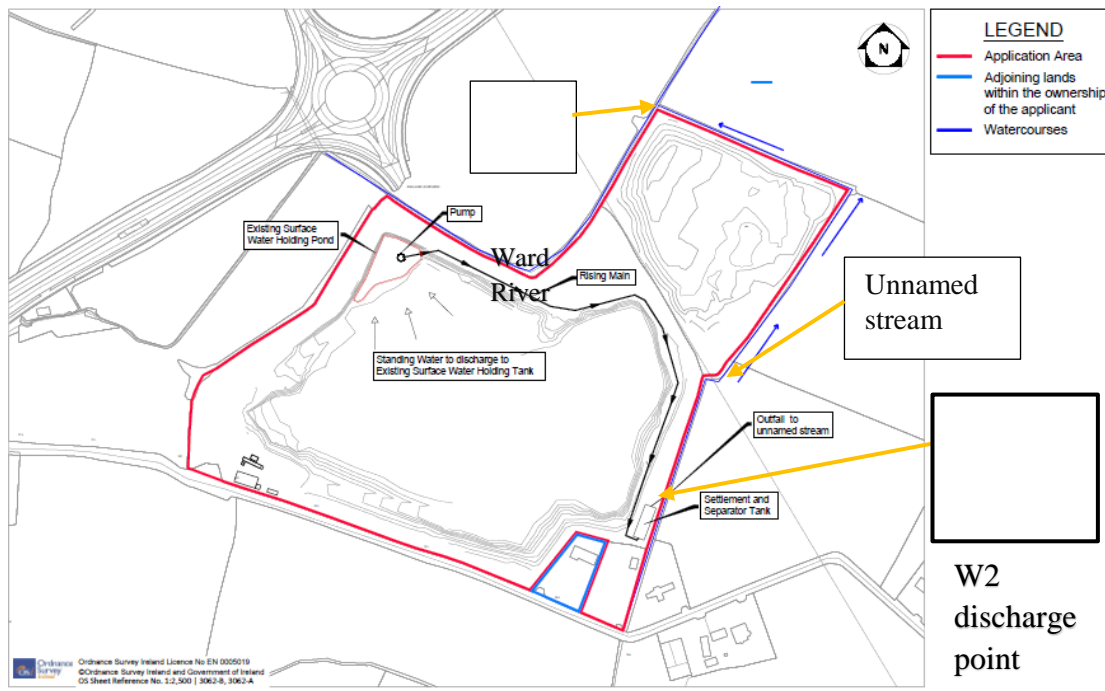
Drainage System Layout and W2 discharge point. [from application: Drawing 14C Drainage 'C' Site Drainage Systems Layout (Drg. No. DG0014-C) April 2019].
